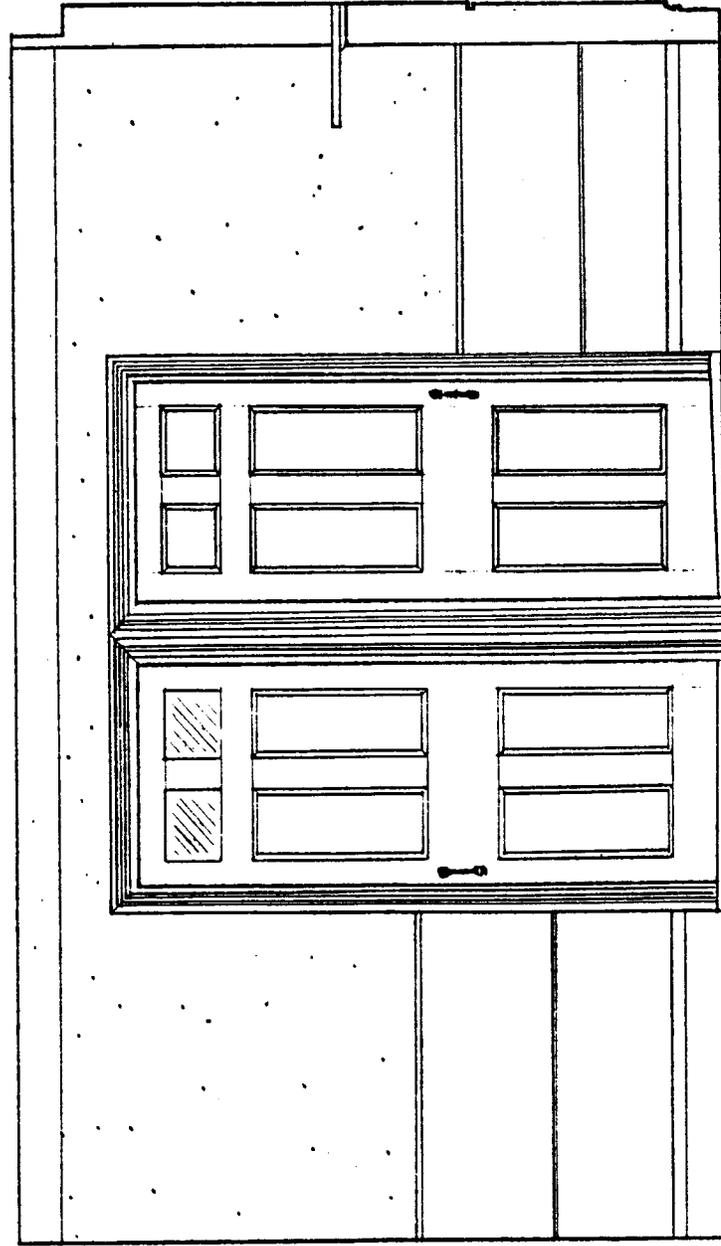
Atwood-Higgins House: East Front Room, North Wall.
